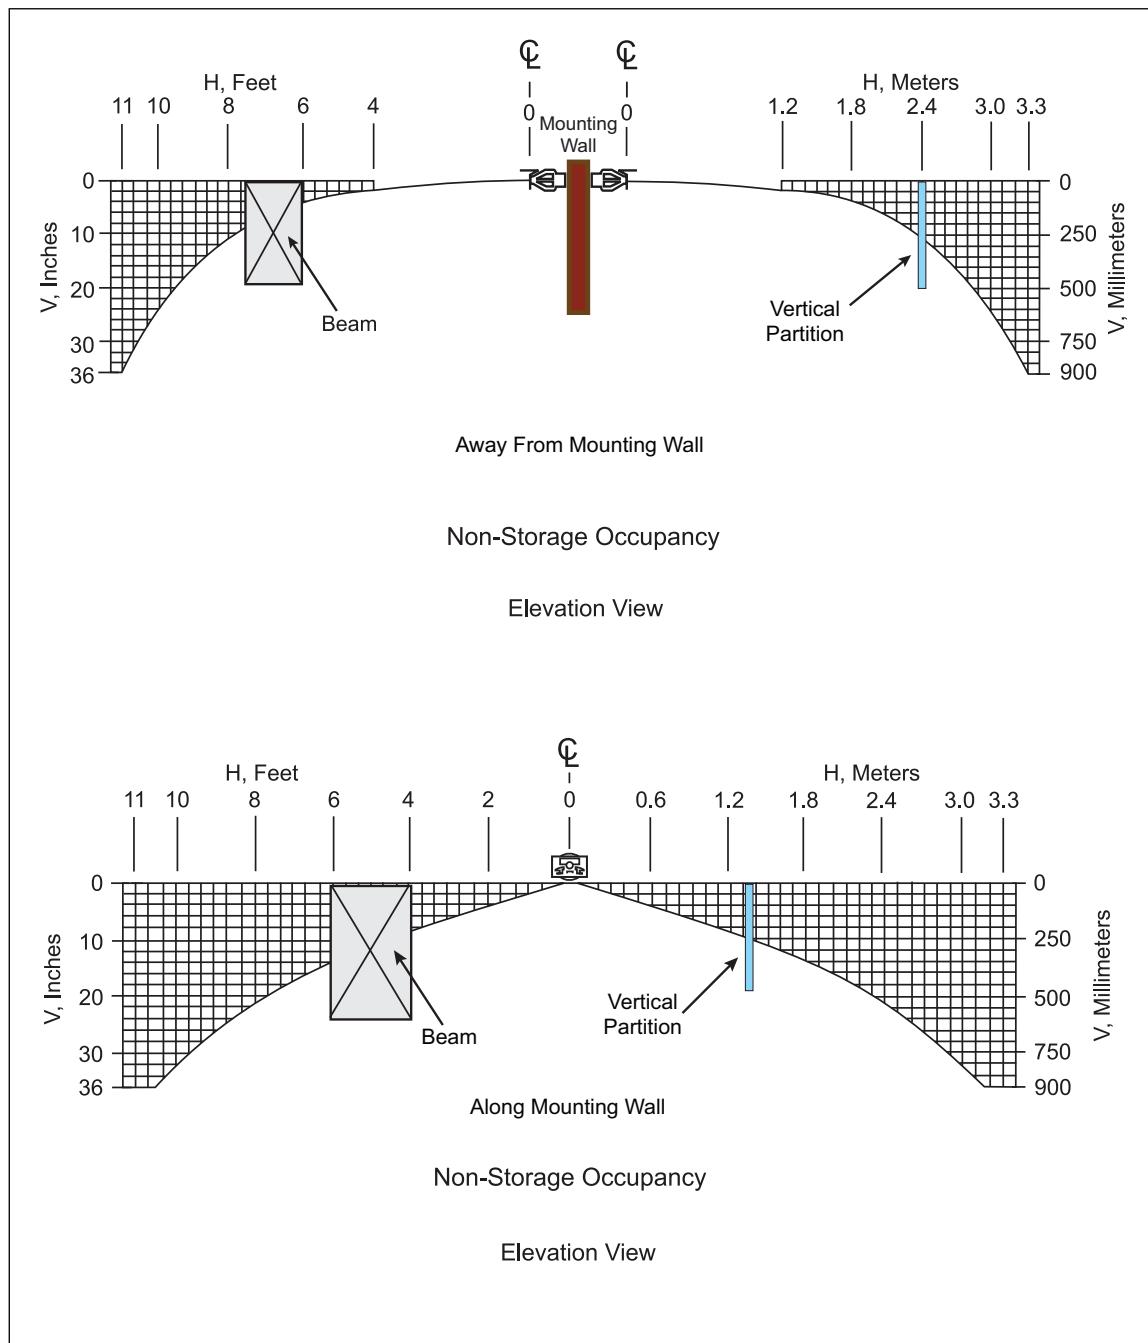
(a). Example of ceiling structural members that obstruct sidewall sprinkler discharge pattern
